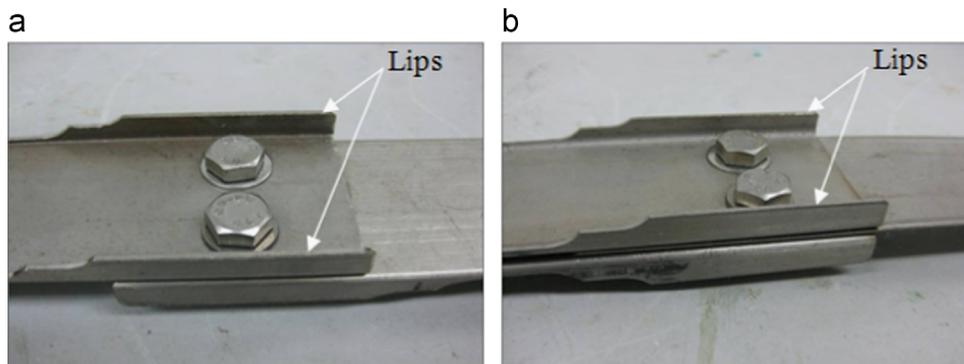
Test specimens of two-perpendicular bolted connections. (a) Single shear and (b) double shear.
